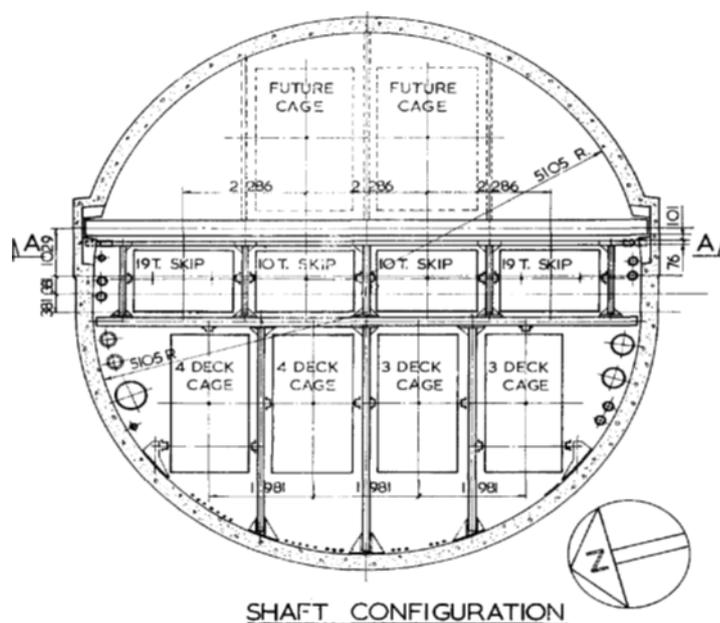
Typical Mine Shaft Dimensions (Hillhouse and Lange, 1973)
